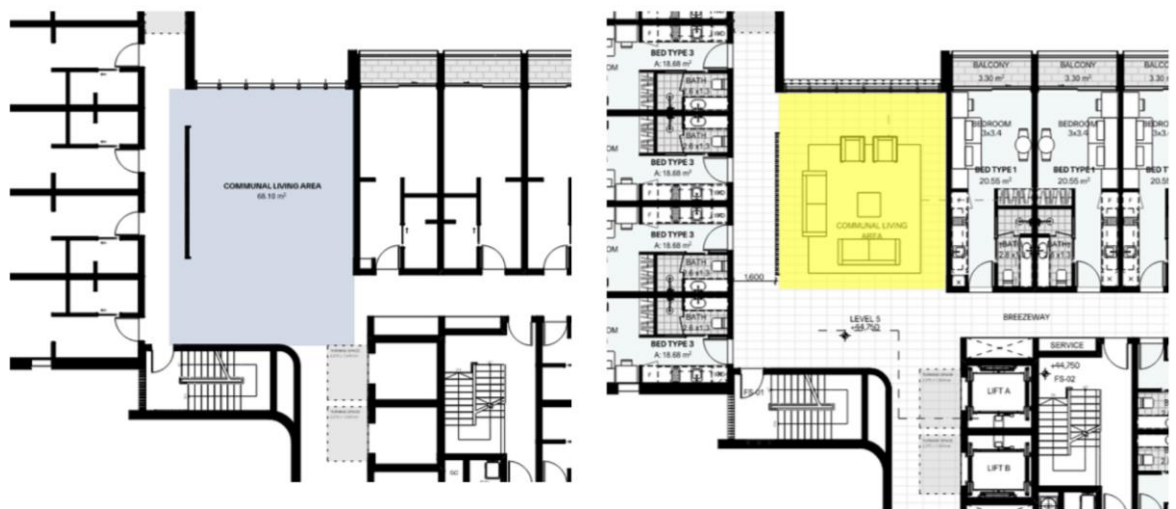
Communal living area calculation plan (left) and Council markup of Level 5 floor plan (Source: PBD Architects and Council Officer markup)
